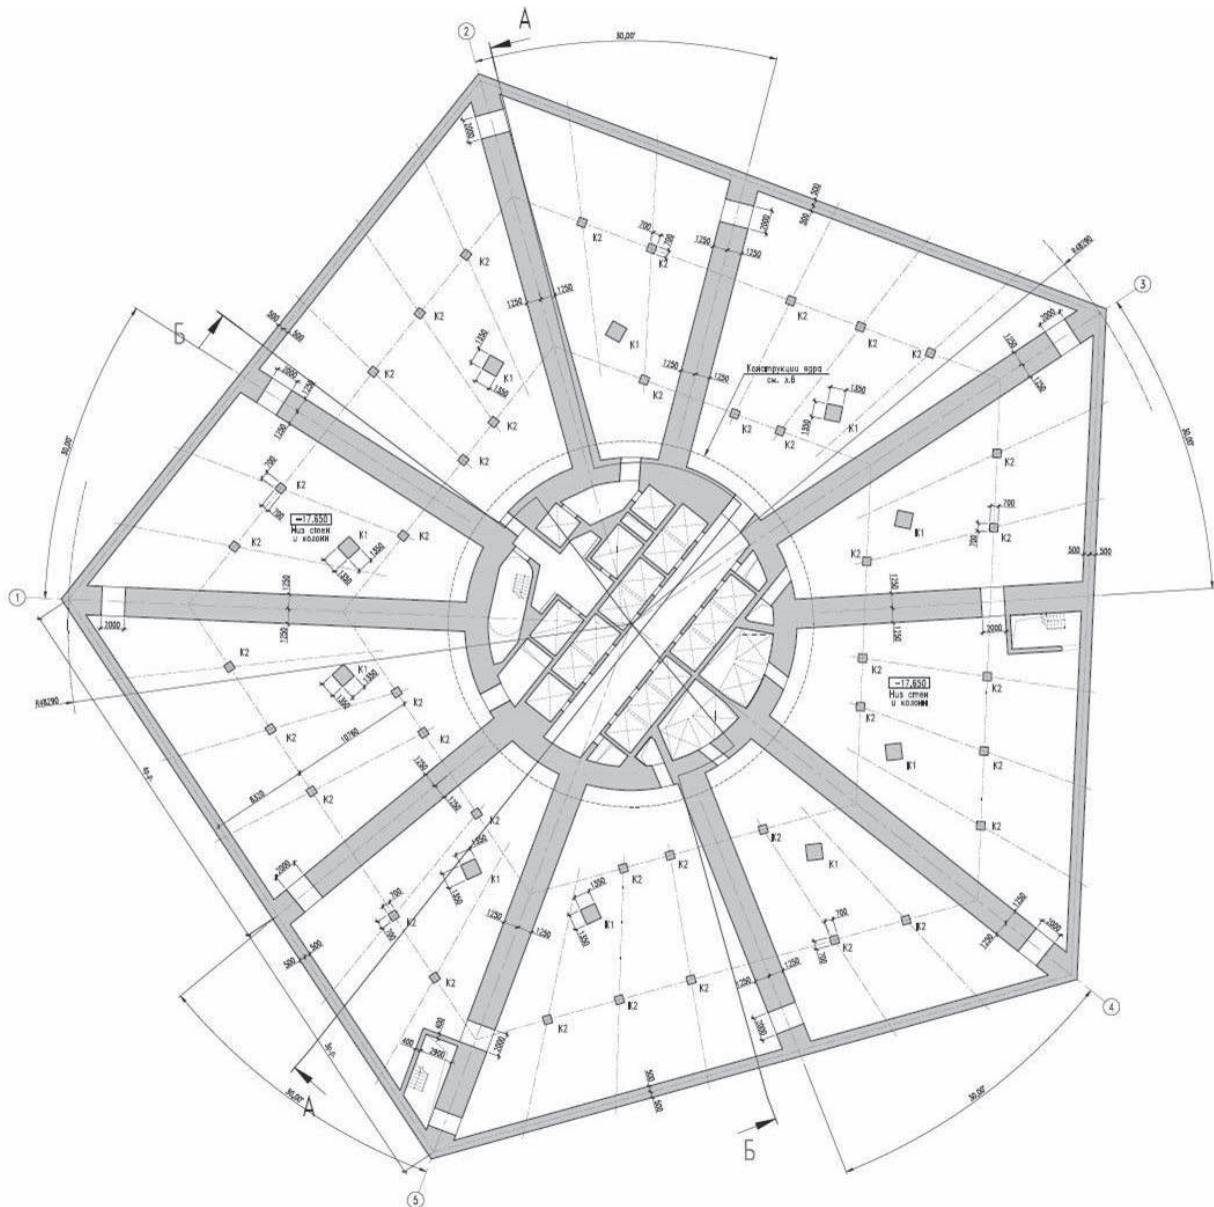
Walls and columns of the lower level of the box foundation of the tower.
